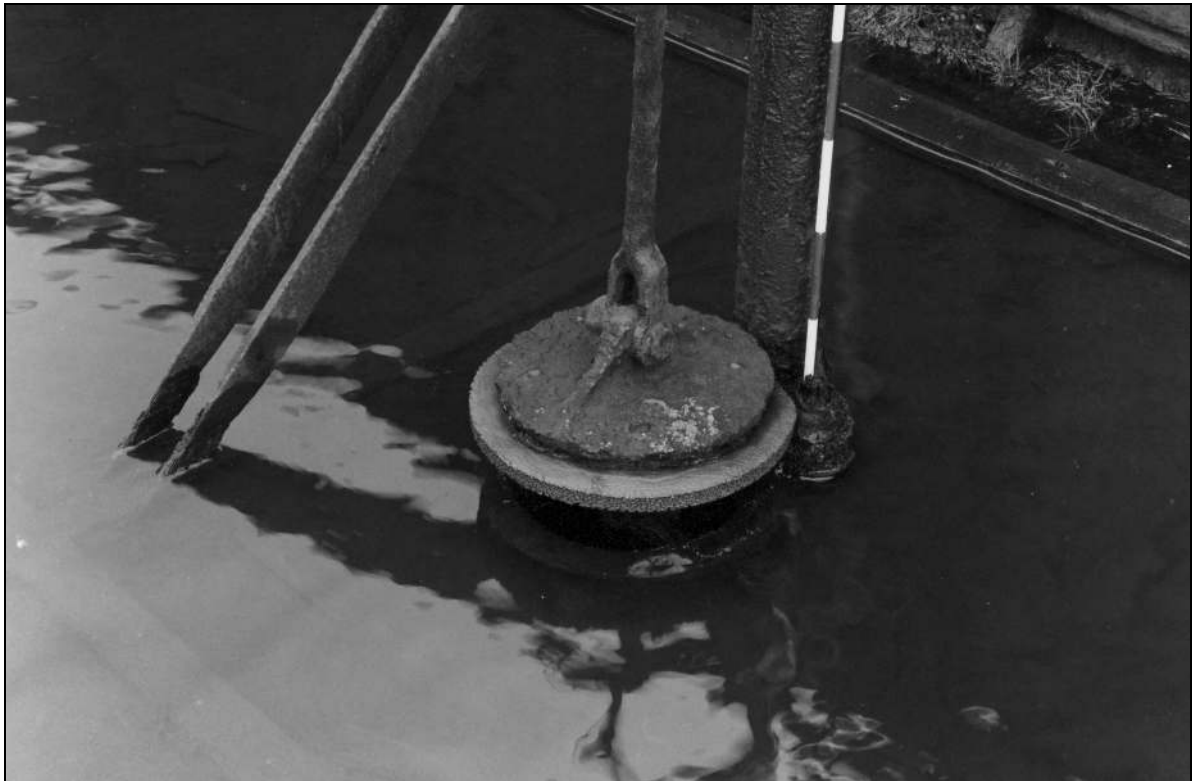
Detail of outlet pipe at base of tank, with stopper (film 7, frame 5)
